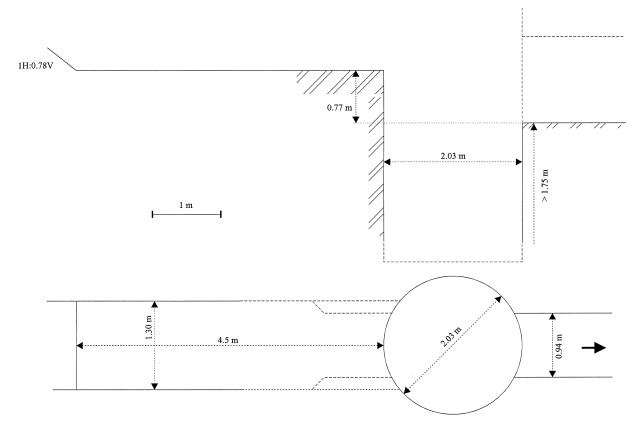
Dimensioned drawings of dropshafts. Chabet Ilelouine (Cherchell aqueduct).
